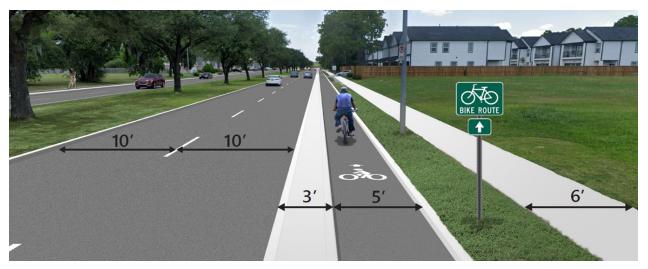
Proposed Separated Bike Lane on West Tidwell Road
